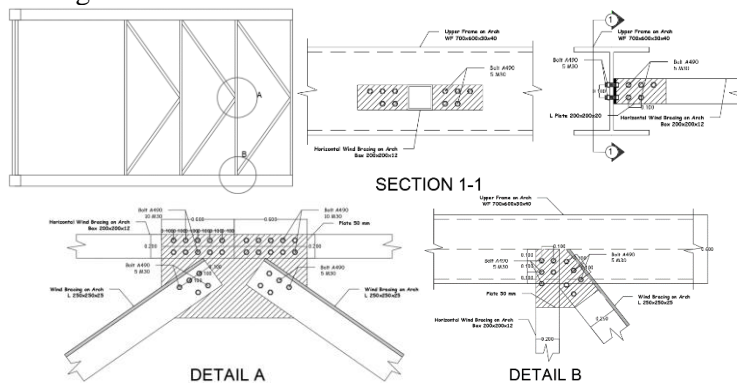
Detail Connection Bolts Wind Bracing on arch to Horizontal Bracing on Arch
